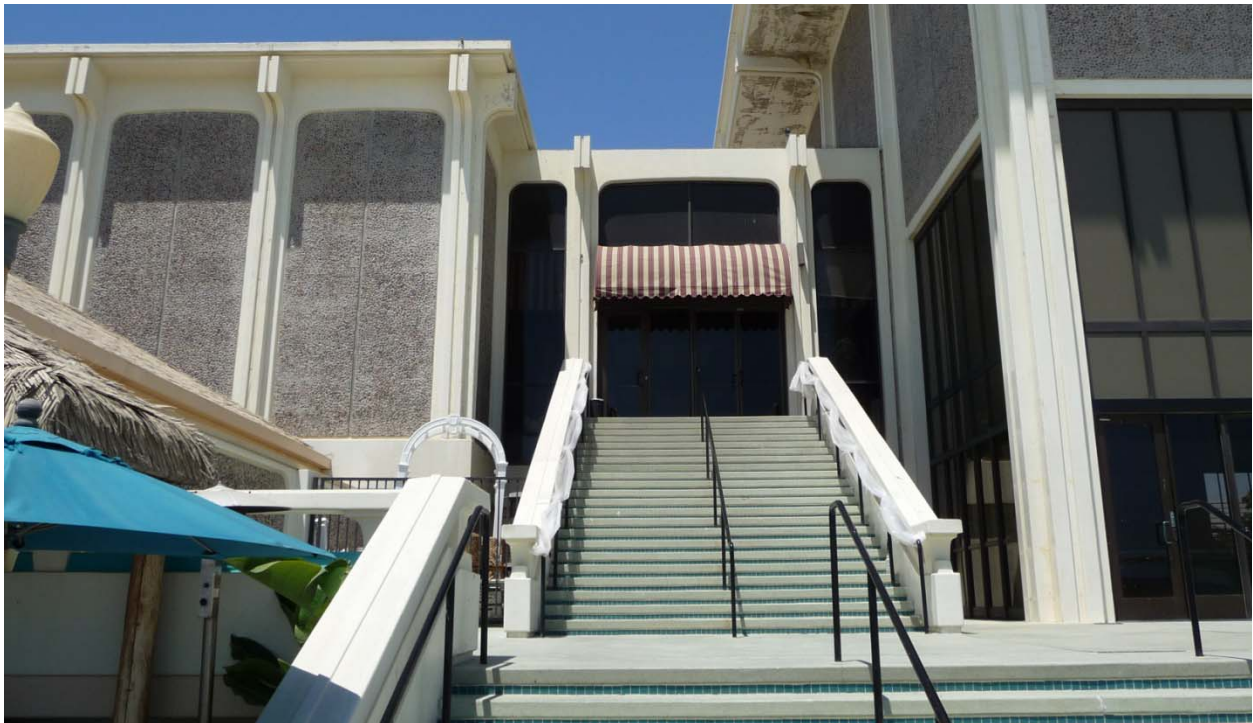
Stair at Community Building 2<sup>nd</sup> Floor South Entrance
